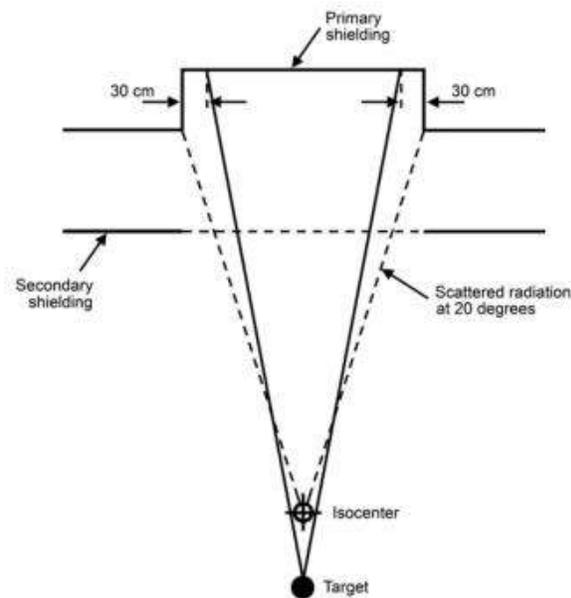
Arrangement for the primary barrier when the inside is continuous.
